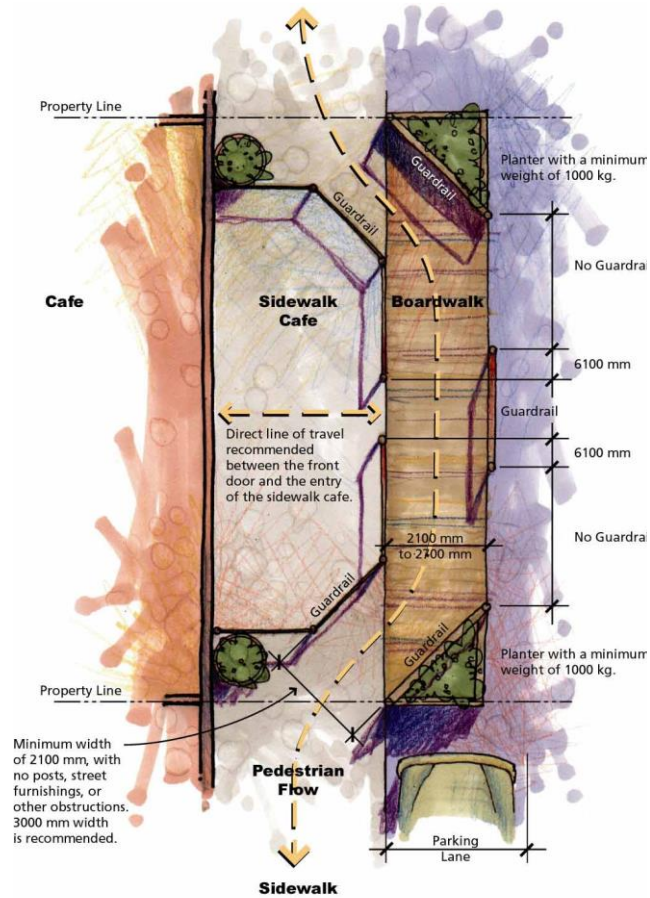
Diagram showing construction of temporary sidewalk to allow for a sidewalk café.
